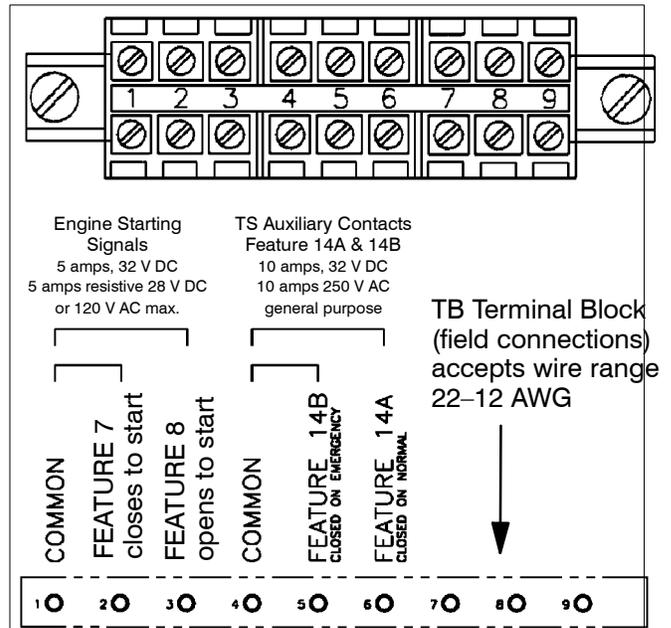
Connections to engine starting contact terminal block located on 1600 through 3000 amp. G-design transfer switches.
